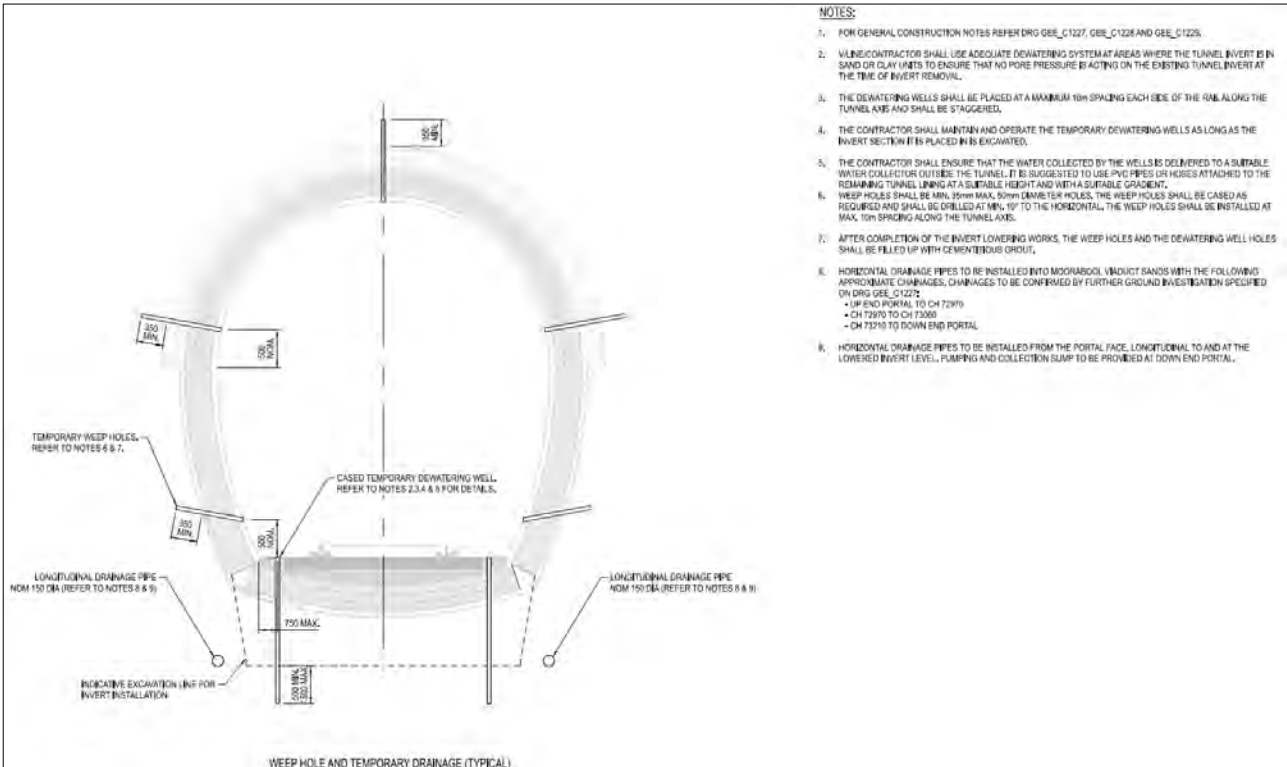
TYPICAL CROSS SECTION OF TUNNEL SHOWING WEEP HOLES AND TEMPORARY DRAINAGE SUPPORTING INVERT LOWERING WORKS. (SOURCE: AURECON/VLINE)
